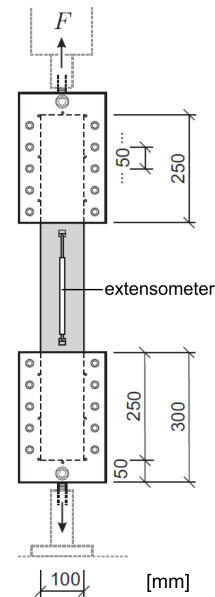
Uniaxial tension test of carbon reinforced concrete specimen [7]
